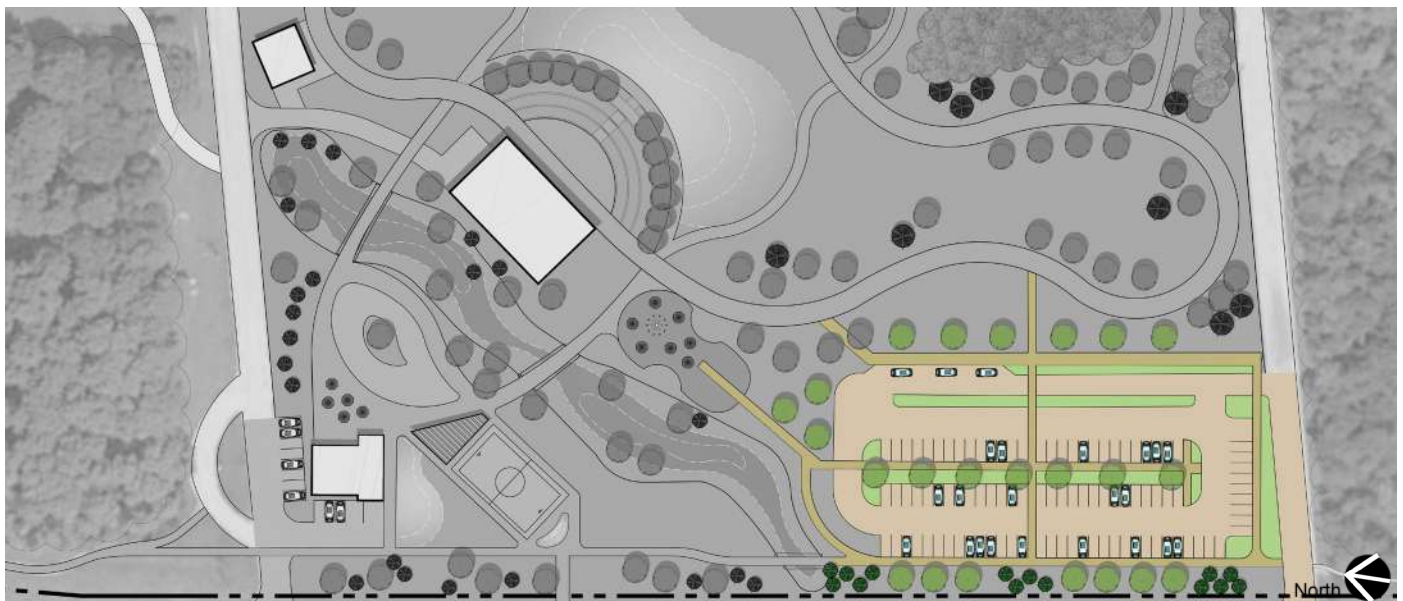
Master Plan Concept Design for Enhanced Parking Lot & Drop-Off
